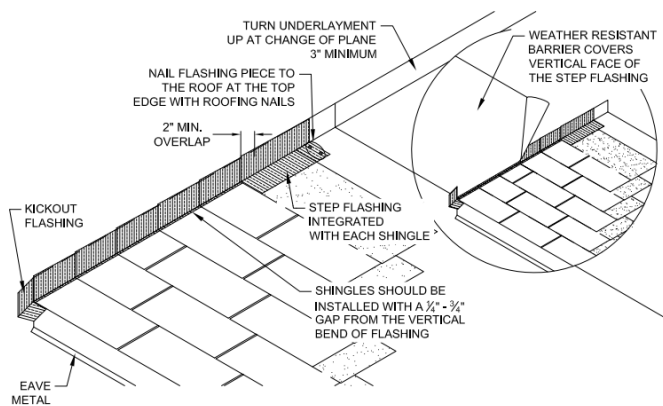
Step Flashing Application at Roof-to-Wall Transitions
